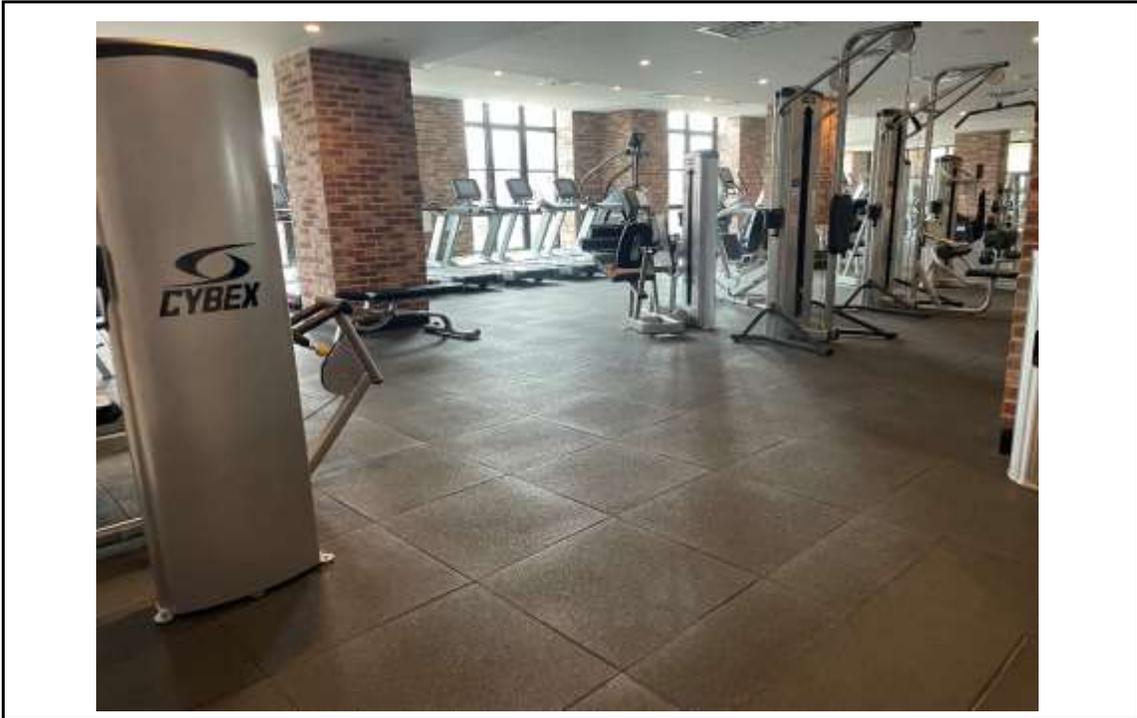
First floor concrete slab covered with soft tiles within the gym, facing southeast. 02 March 2023.
